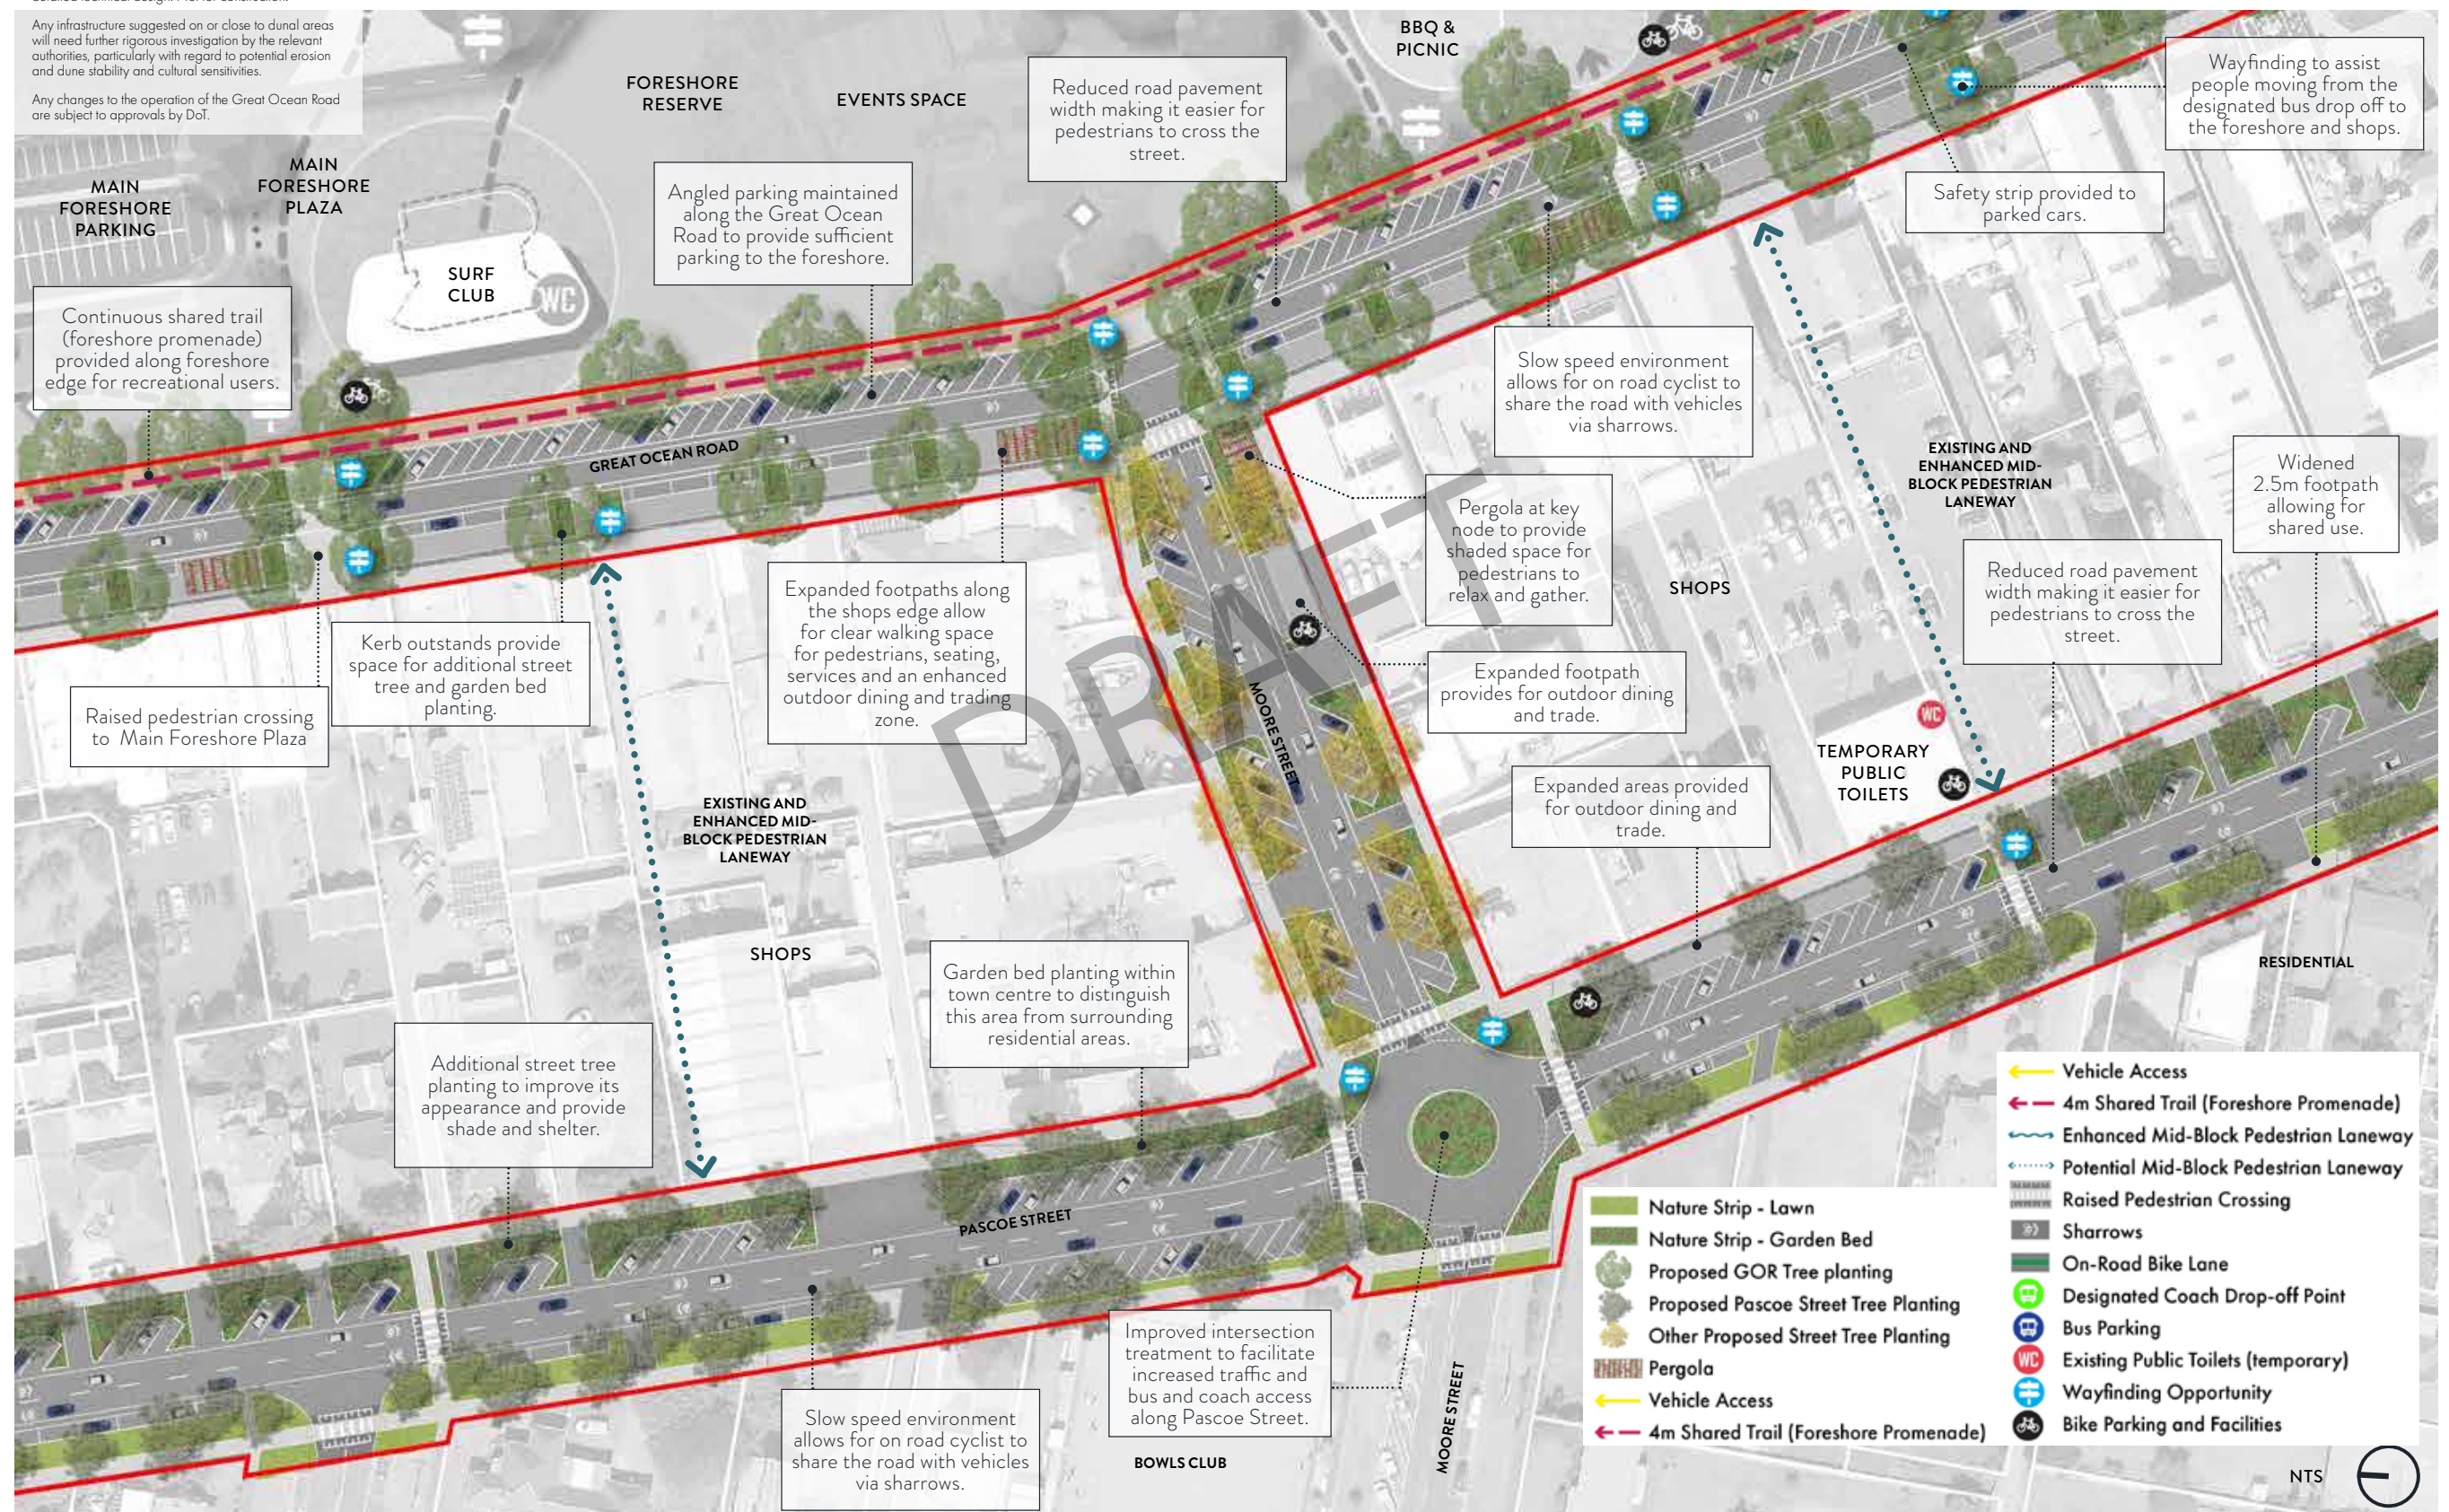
Detailed Streetscape Plan 2 - Option 1 - One-Way
